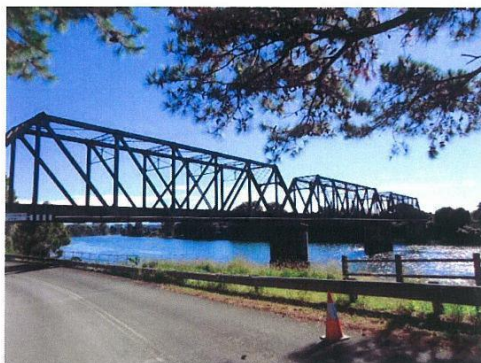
The bridge viewed from Rocks Ferry Road.
